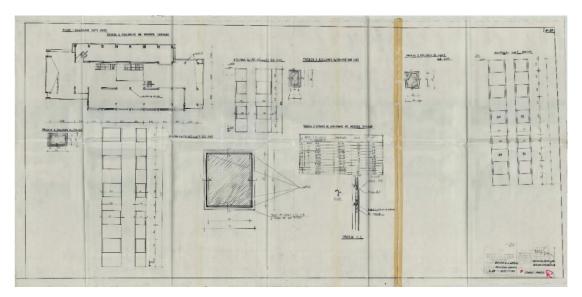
13. Plan of the columns of First Floor. Details. (1973)
